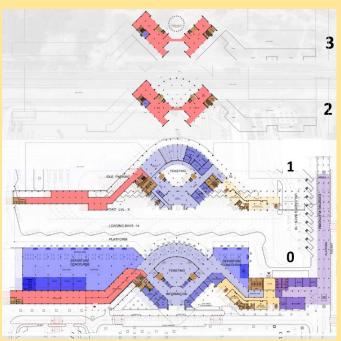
Proposed floor plans of Terminal building (for both proposals)
